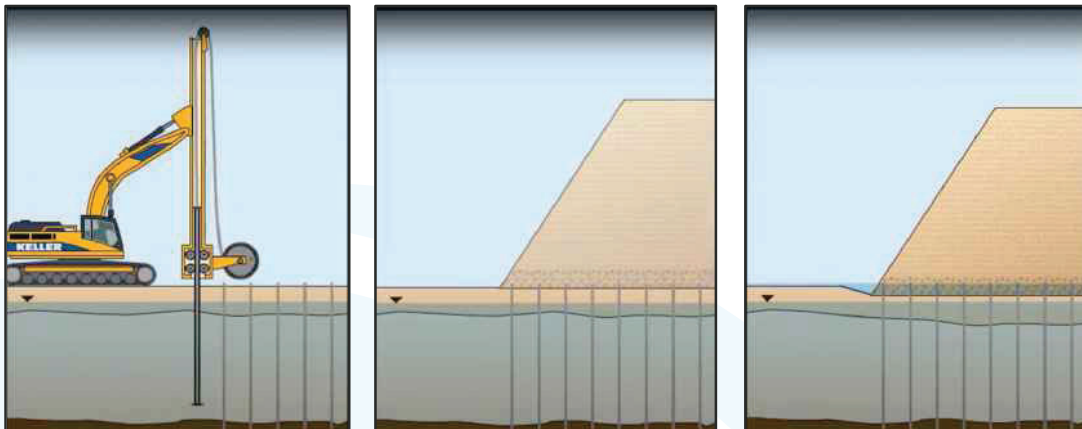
Wick Drains and Preloading ⁽¹⁾
